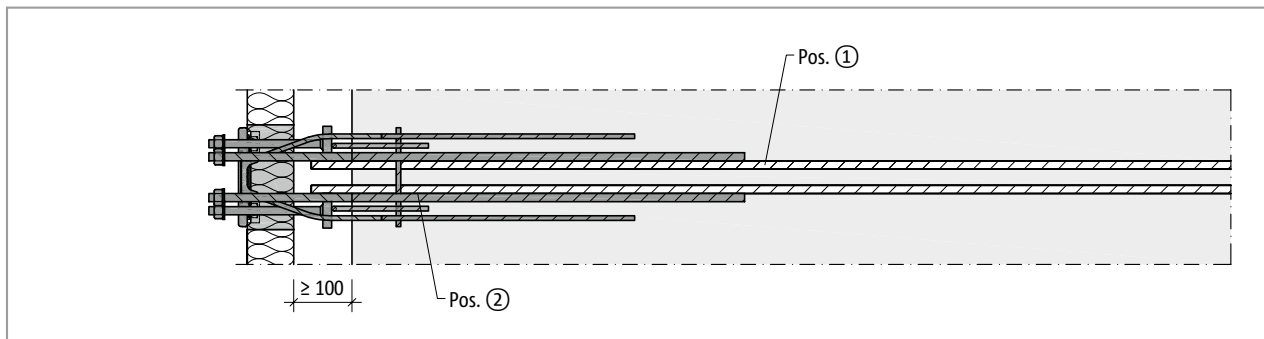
Schöck Isokorb® T type SK-M1: On-site reinforcement for semi-precast construction: Plan view
